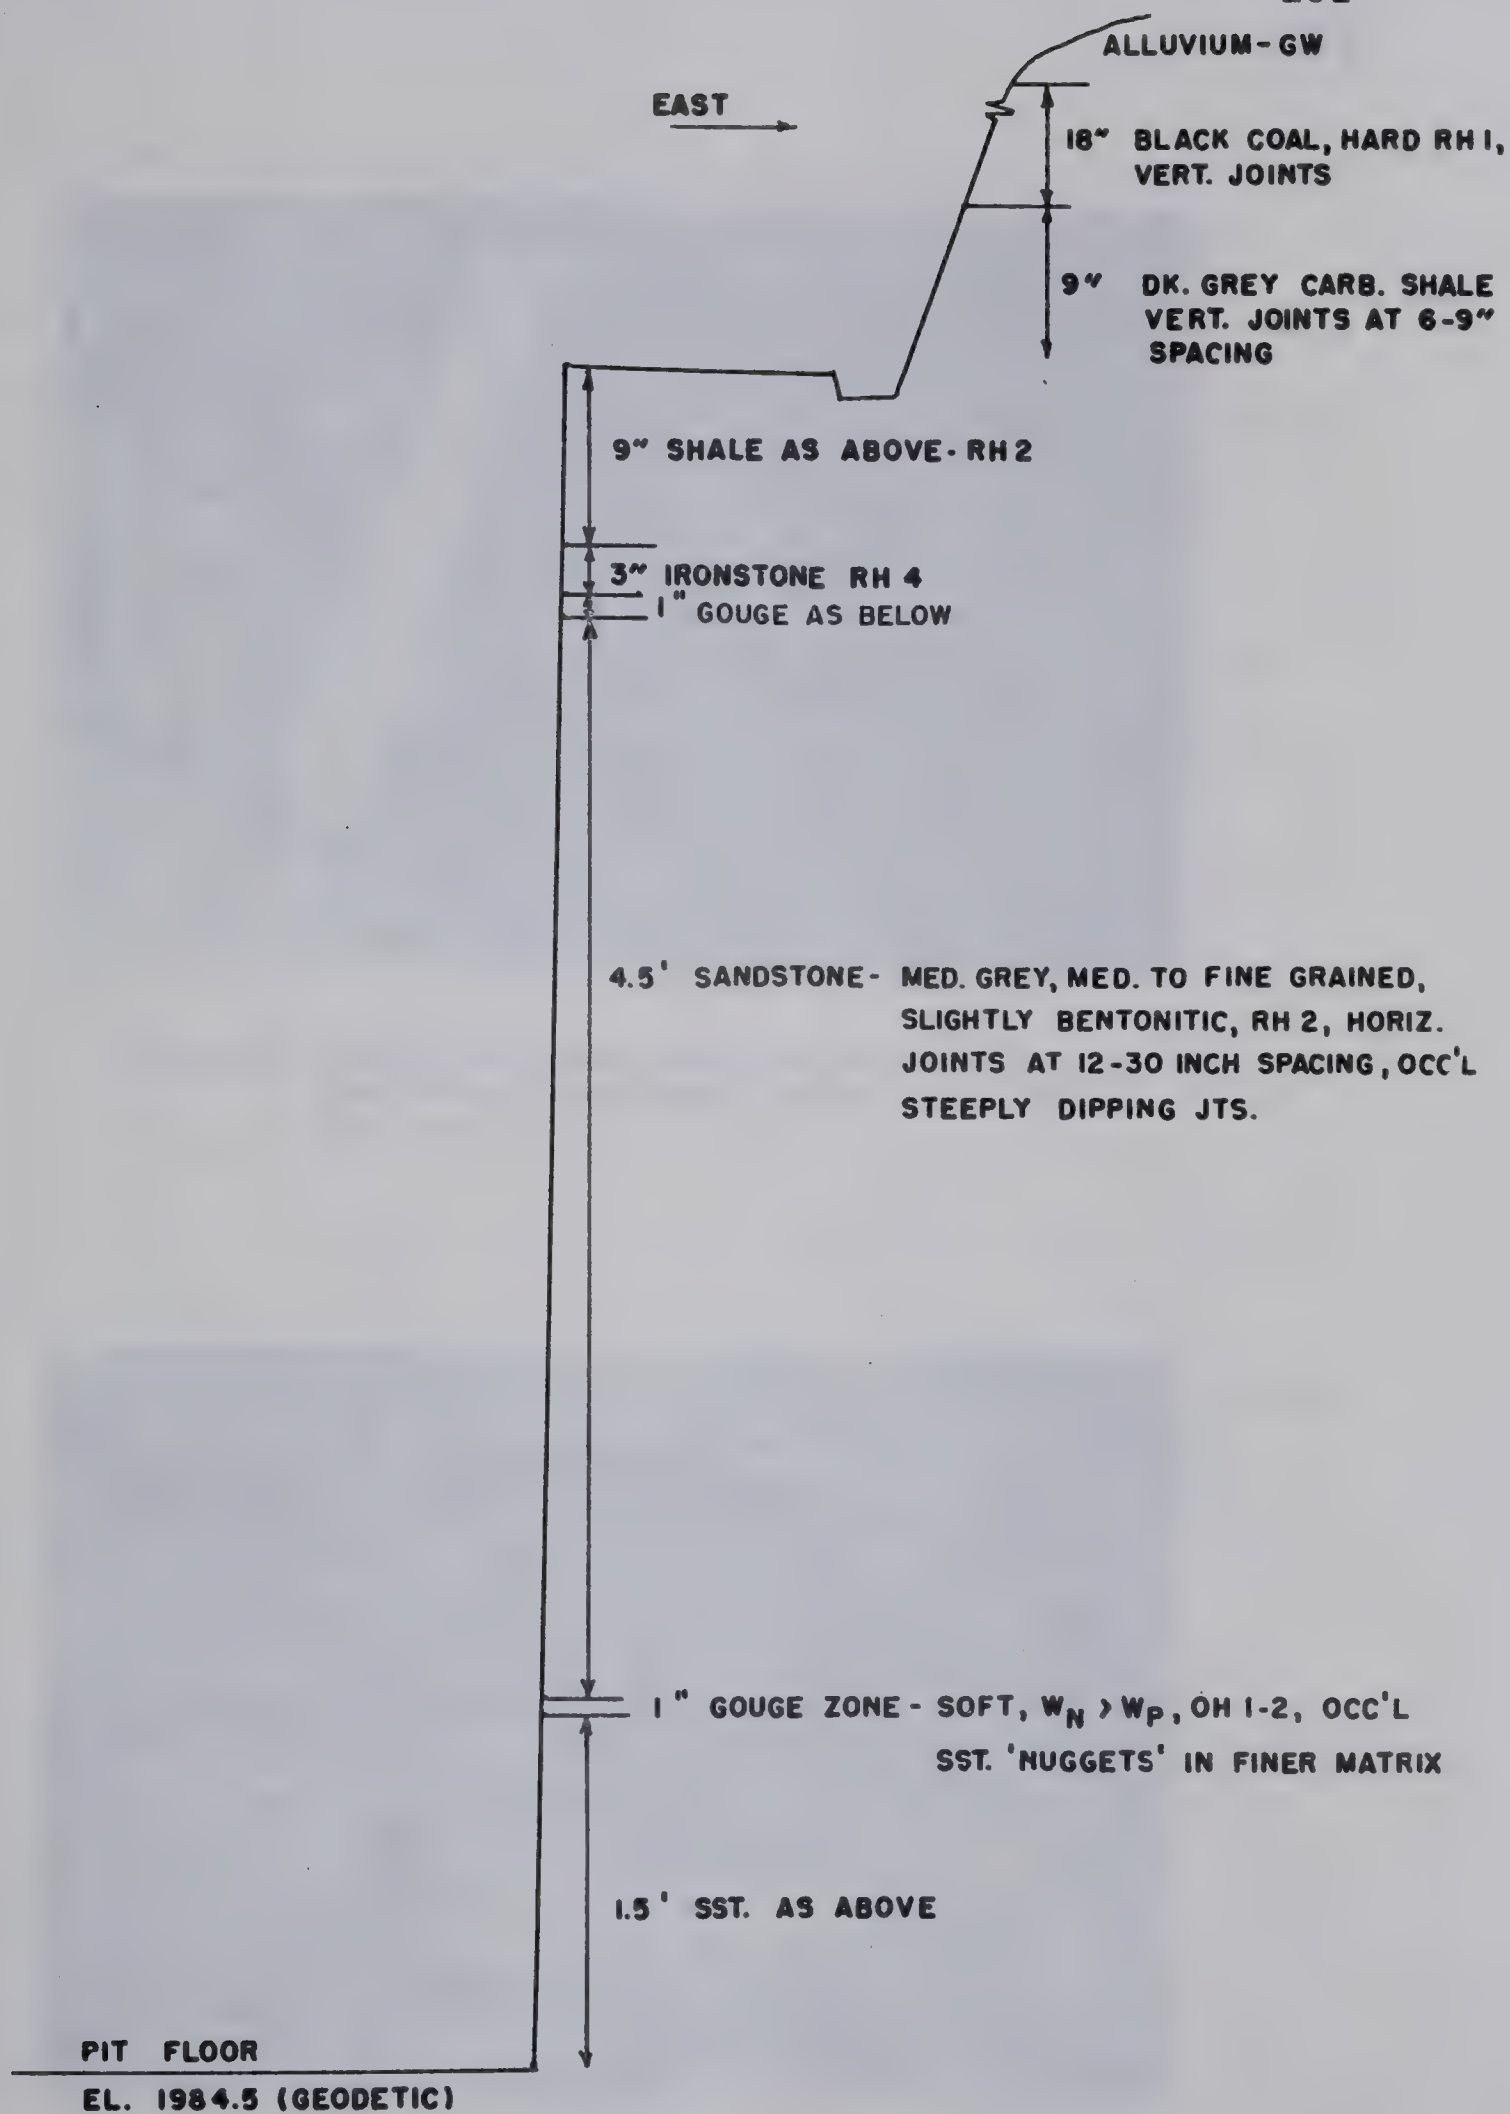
GEOLOGIC SECTION, EAST WALL, PIER 2, BEVERLY BRIDGE
